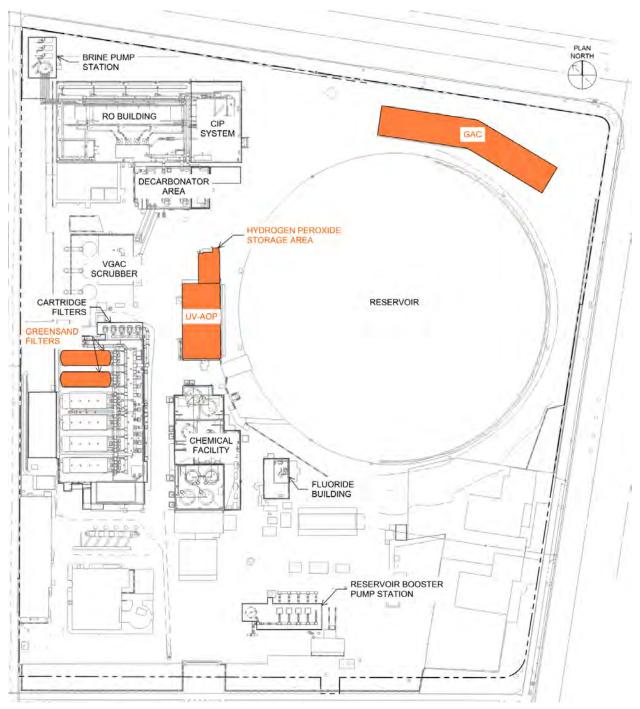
Olympic AWTF and Arcadia WTP expansion site plan
